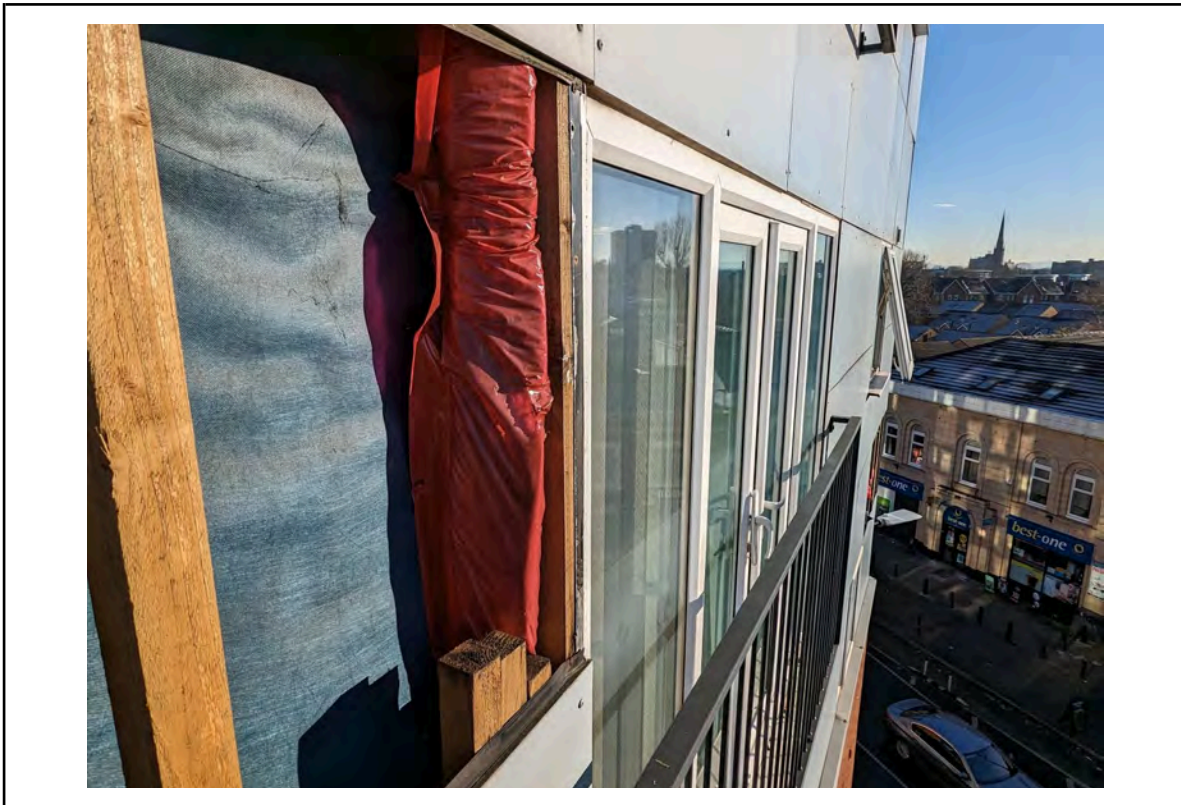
Location 5 - HPL removed on 4th floor at front facade
